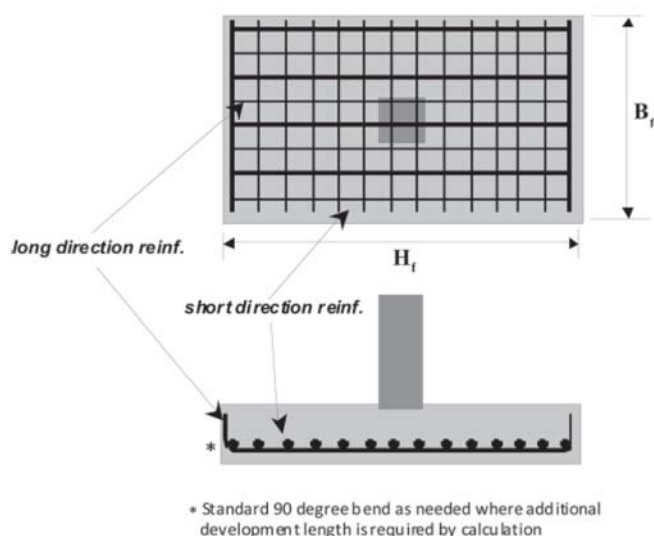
Distribution of reinforcement in rectangular spread footings.
